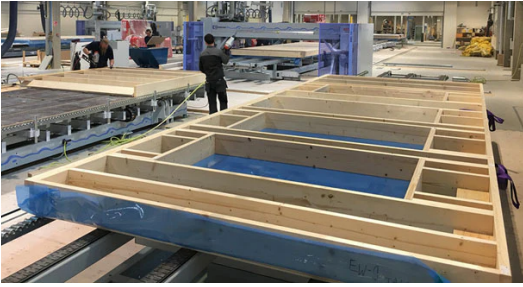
Prefabricated timber frame structure (Friesland Prefab, n.d.)
